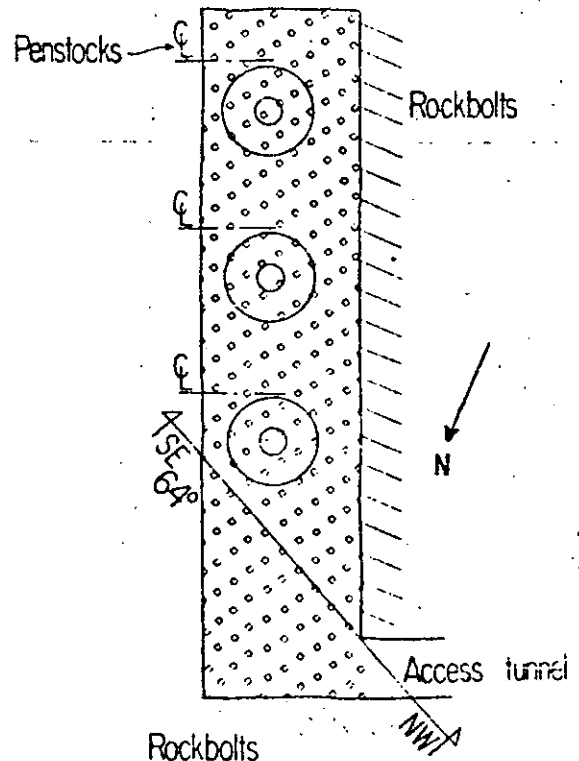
Plan view of the powerhouse that shows the direction of the recommended support in the haul, right and downstream walls
